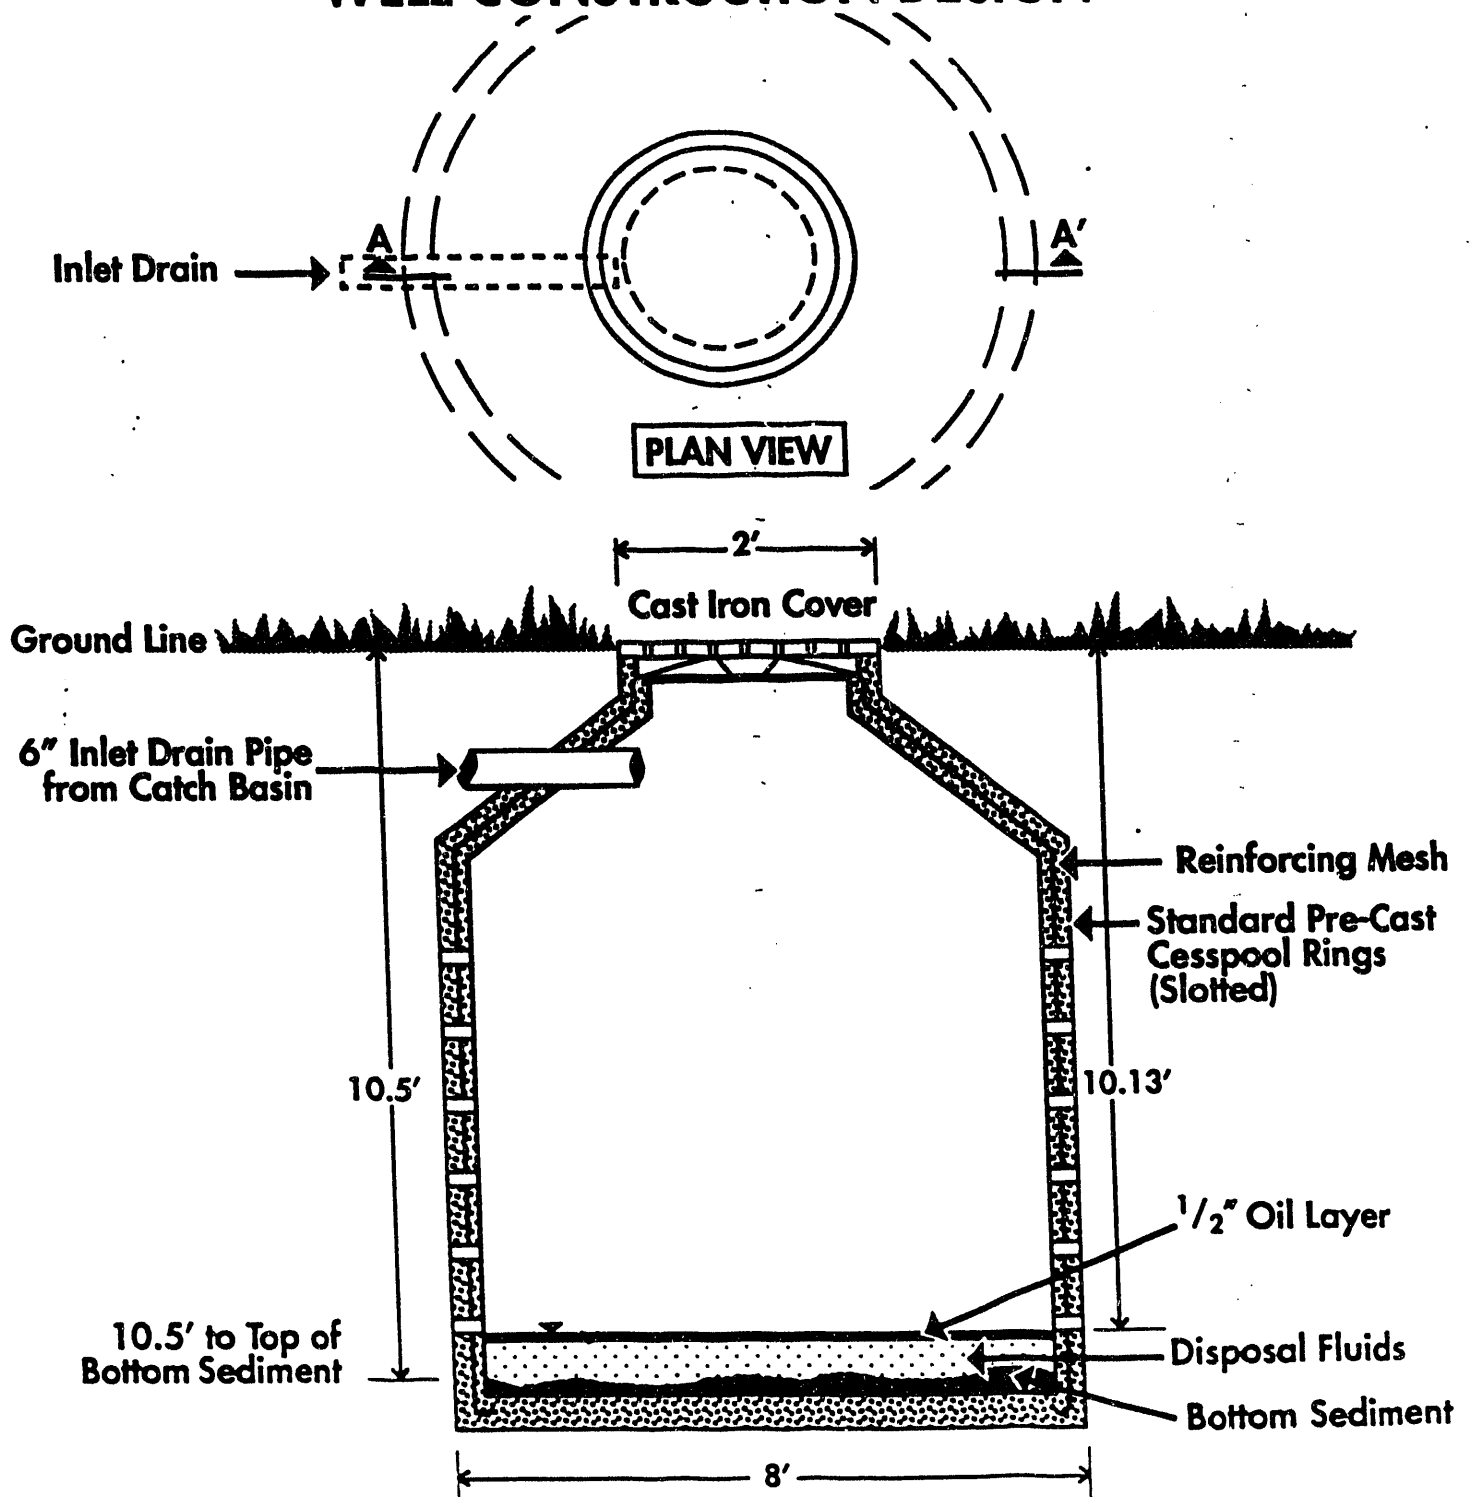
Cross-section of a Stormwater Drainage Well (Class V)
